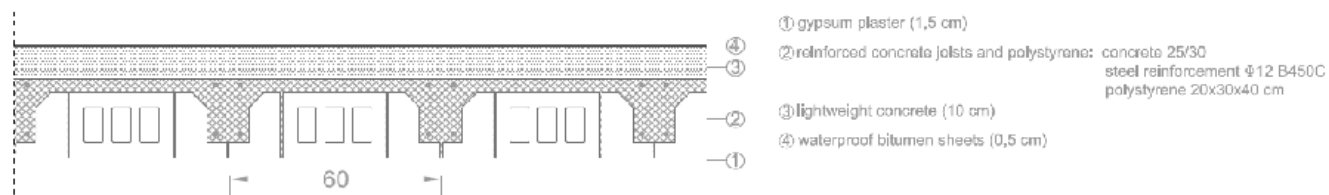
7: Reinforced concrete joists and polystyrene panels- Cross section
